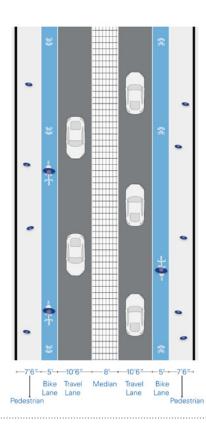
Wapello St. Bridge existing condition and potential streetscape improvements
